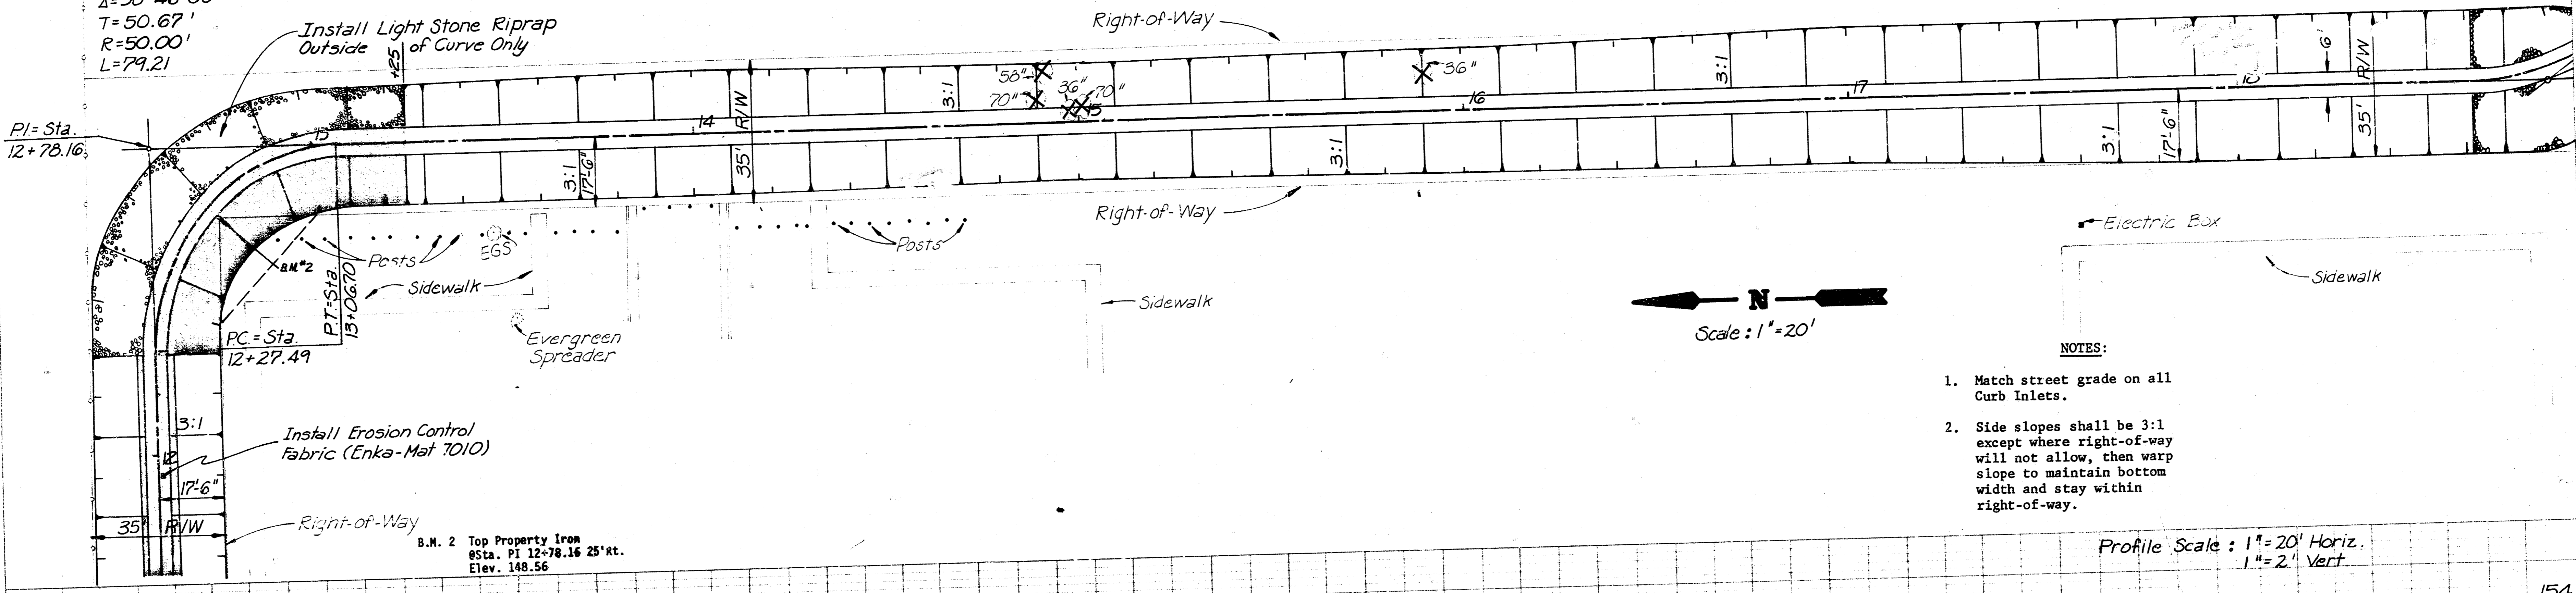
SINGLE PLAN AND PROFILE-FULL LINE
